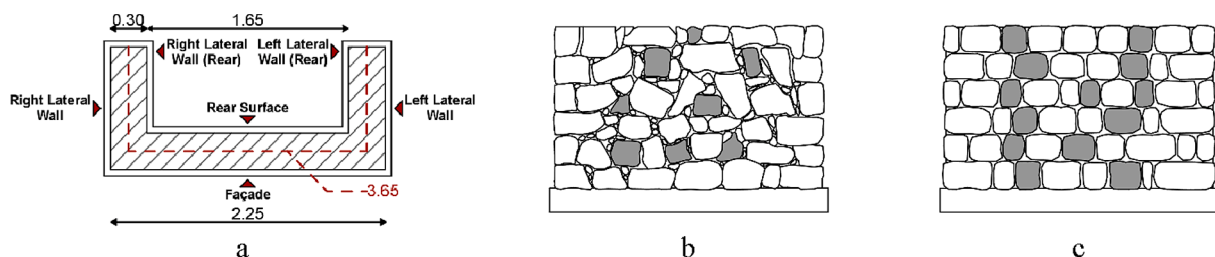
Plan configuration tested specimens (a); front view drystone masonry wall (DS) [39]; (c) front view regular stone masonry wall (REGW) [40].
